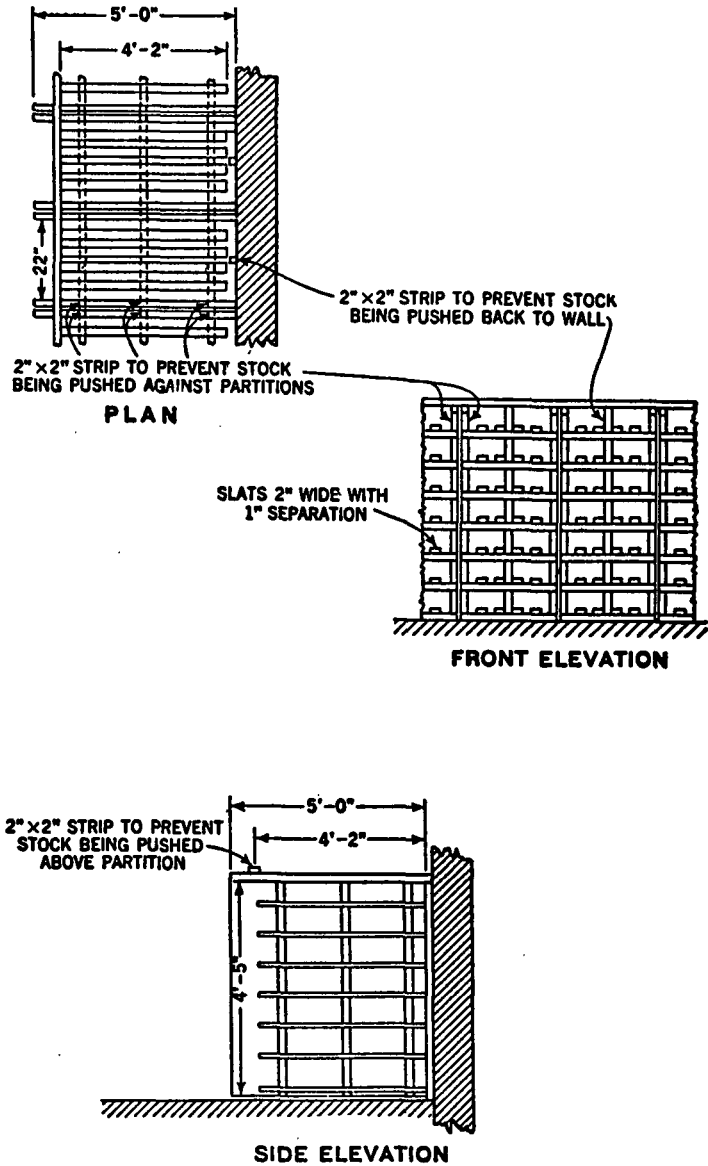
Details of Storage Racks in Raw Stock Storage Vault.
